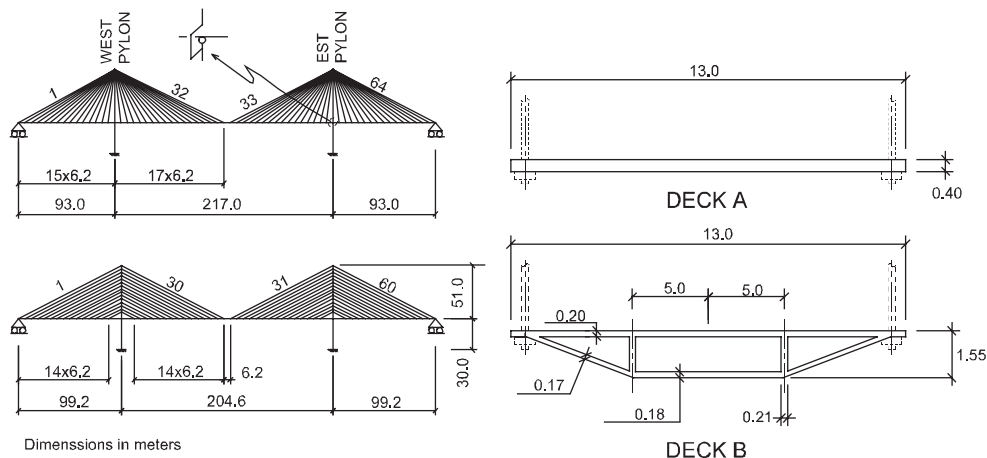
Longitudinal layout of the bridges, numbering of stays and sections of the decks.
